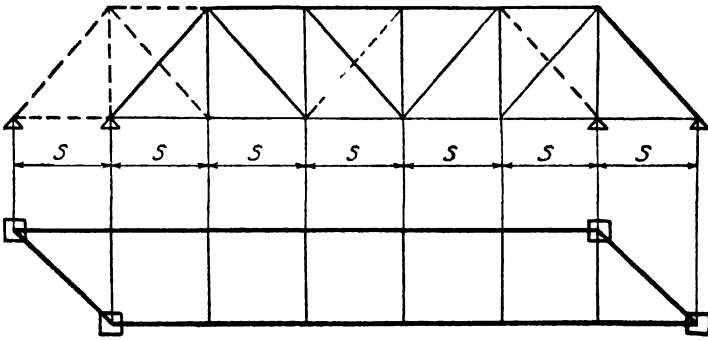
j. Arrangement of Trusses for a Skew Span in which the Skew Can Be Adopted for the Panel Length Throughout.
